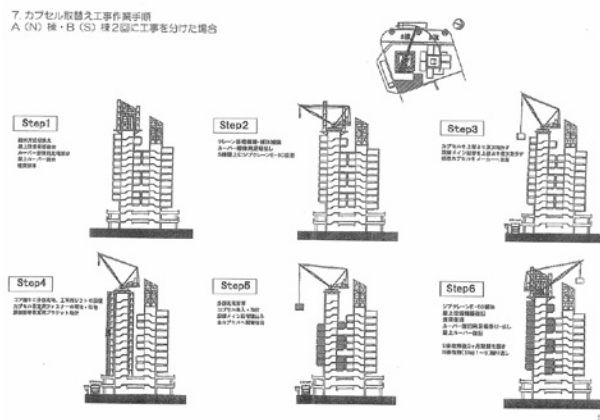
Nakagin Capsule Tower Renovation Plan, Kisho Kurokawa. Steps of replacing capsules.
